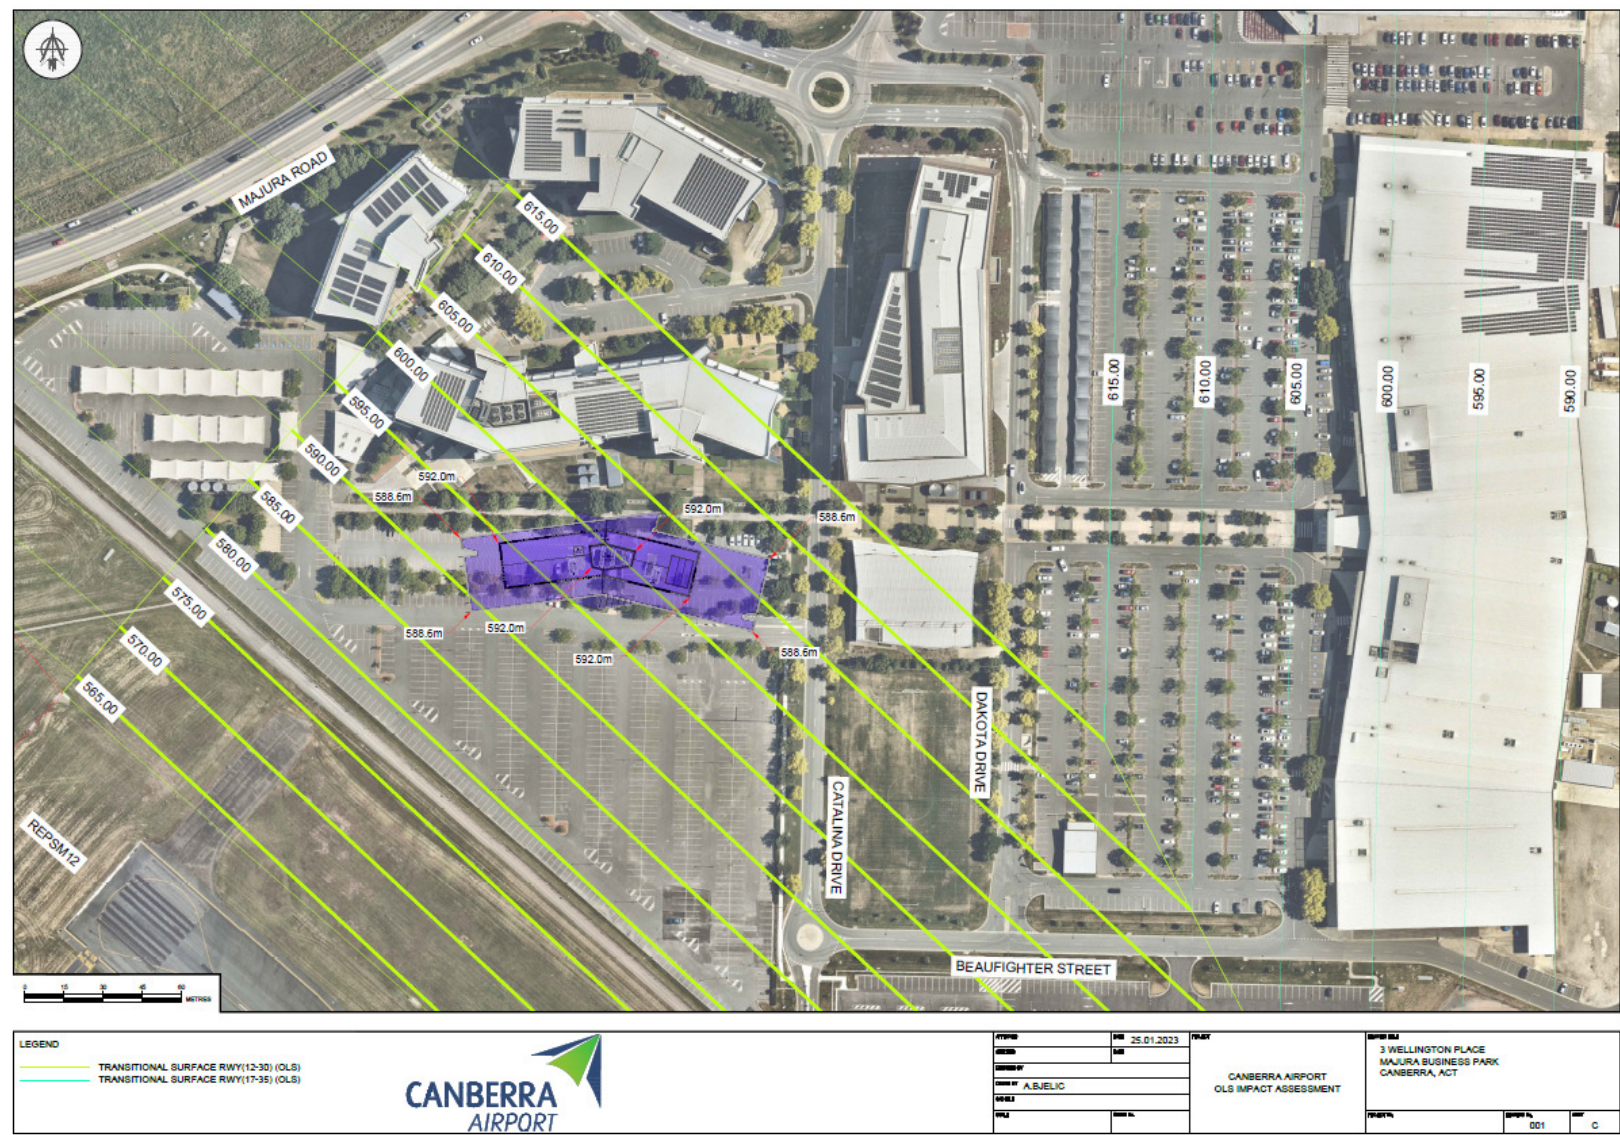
B: OLS Impact Assessment at the proposed building (Plan View)
